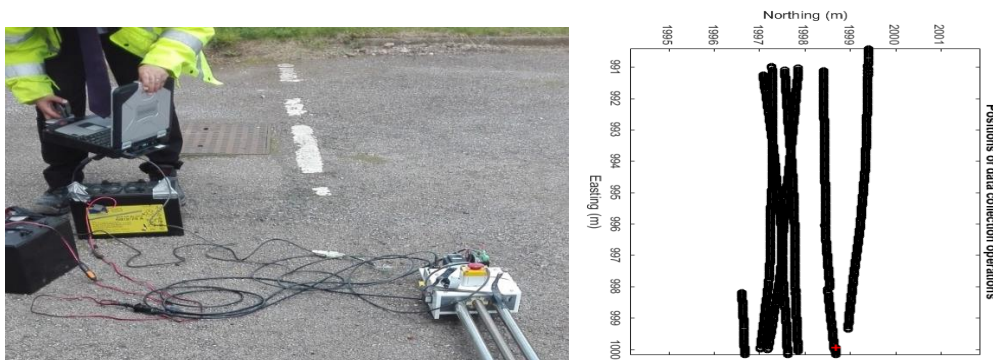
Field survey on the poor pavement at the rear of the Gisbert Kapp building
